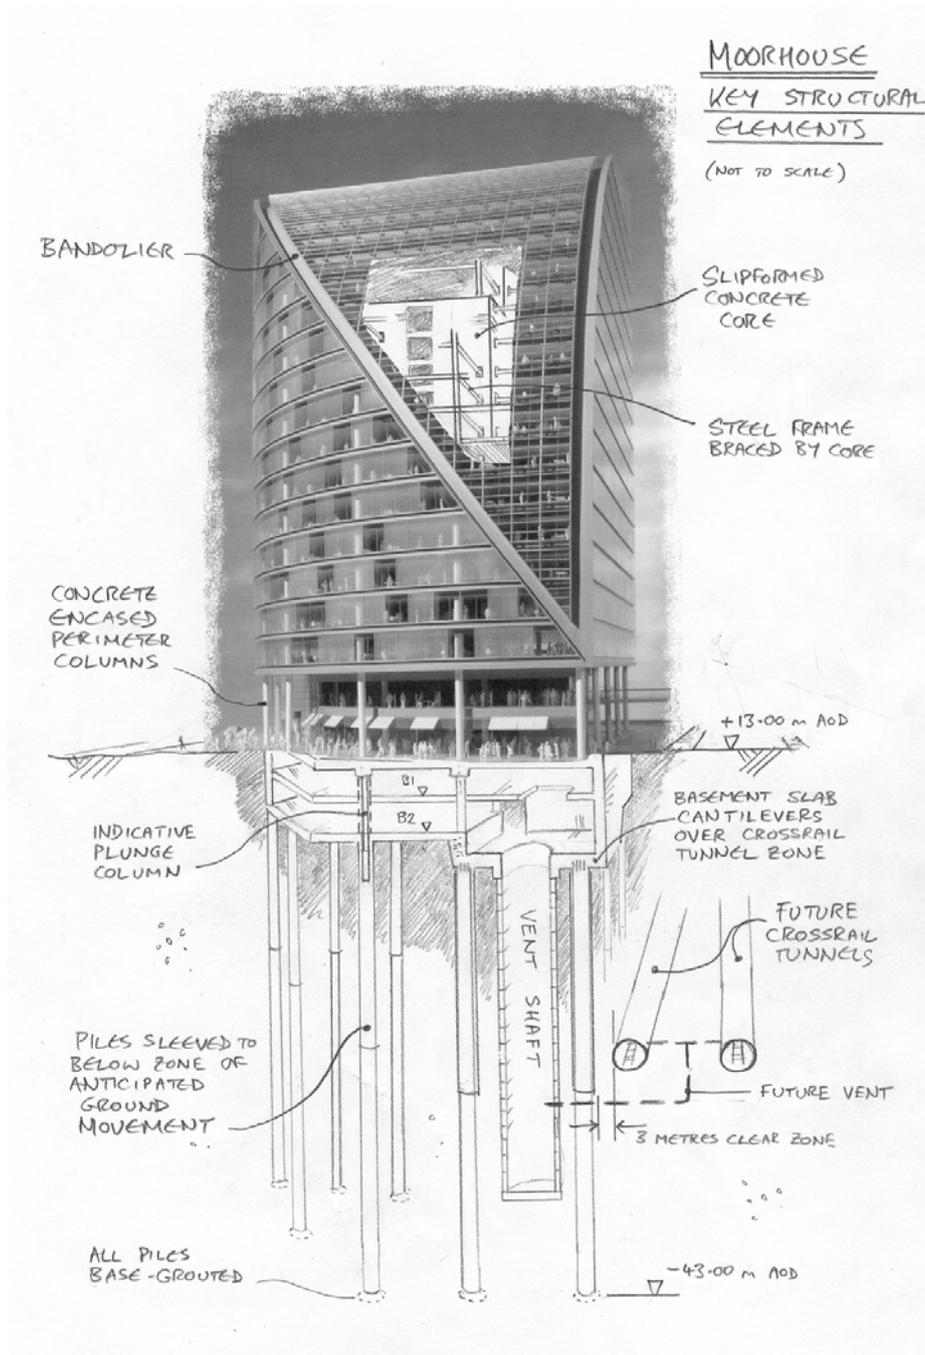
Schematic view of Moorhouse and the Crossrail shaft and running tunnels
